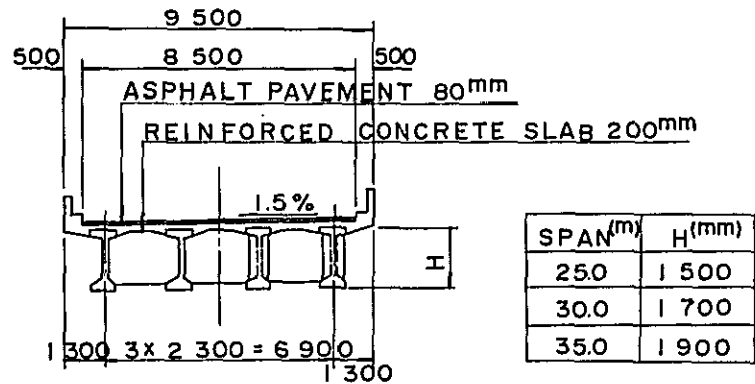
Typical Cross Section of Simple Composite Girder
